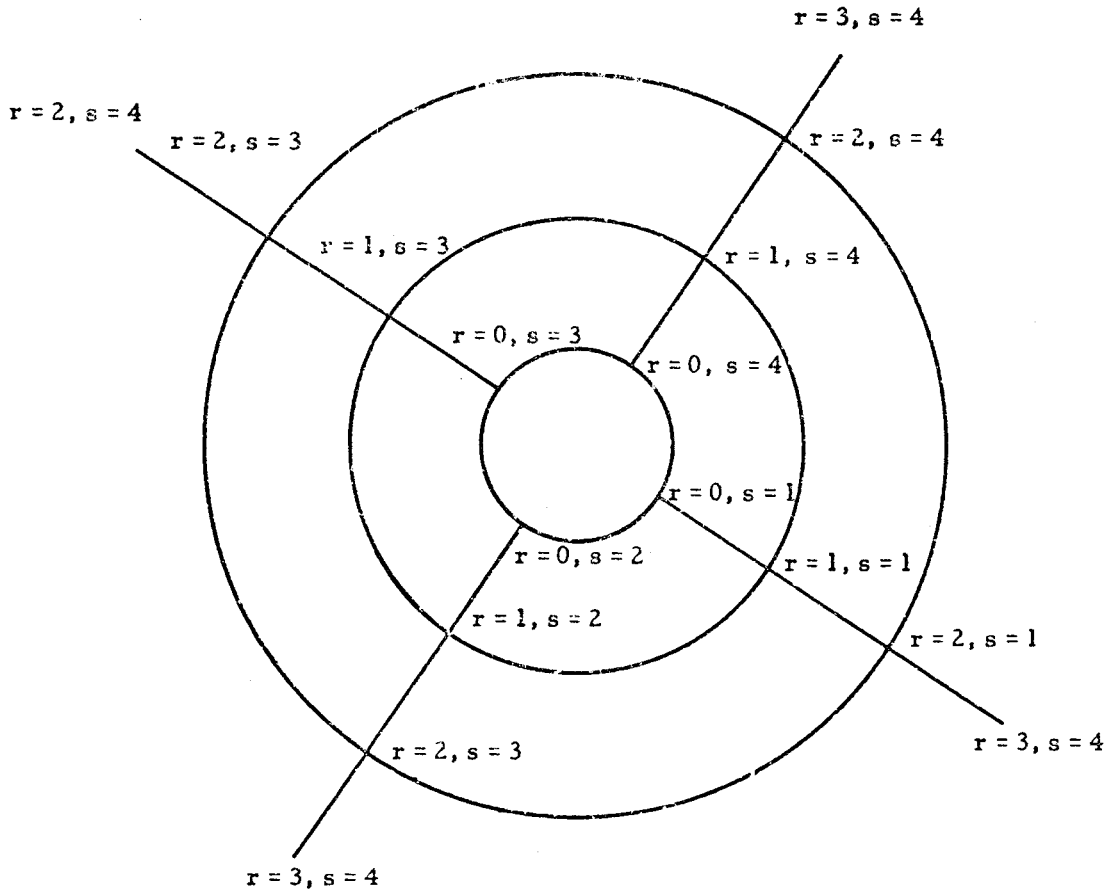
DOME BRIDGE, PLAN VIEW
